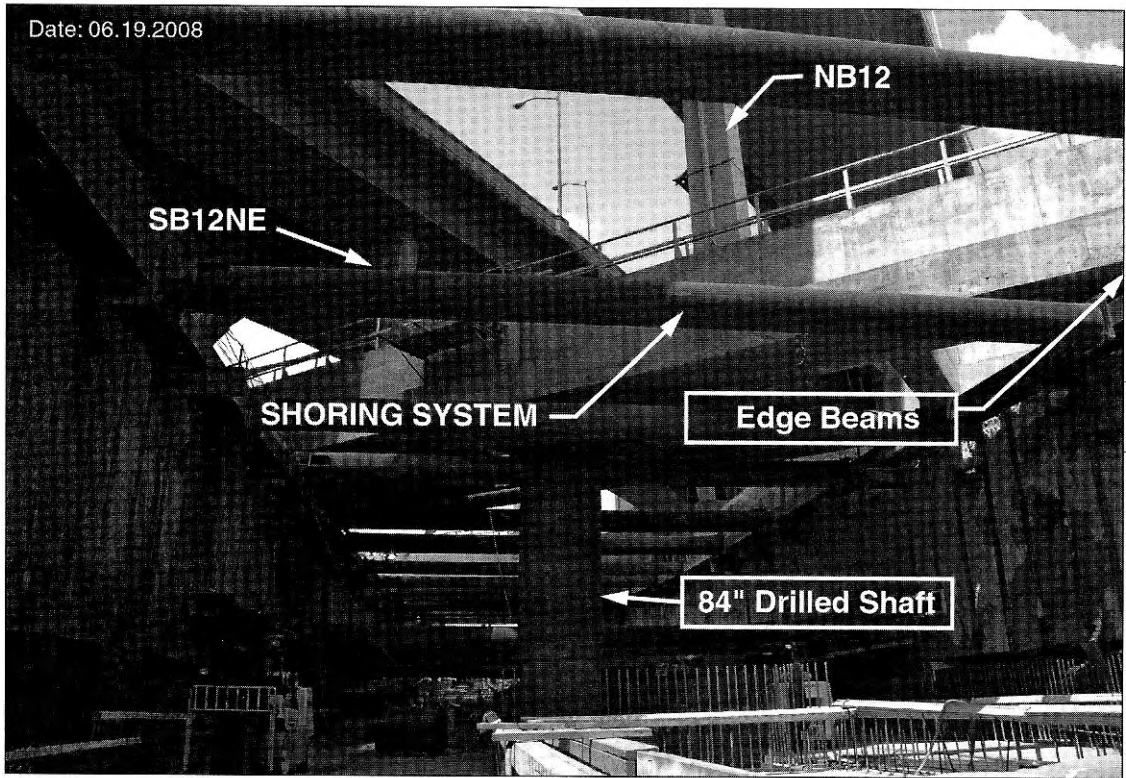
Bent 12 underpinning in place and foundation piles removed.
